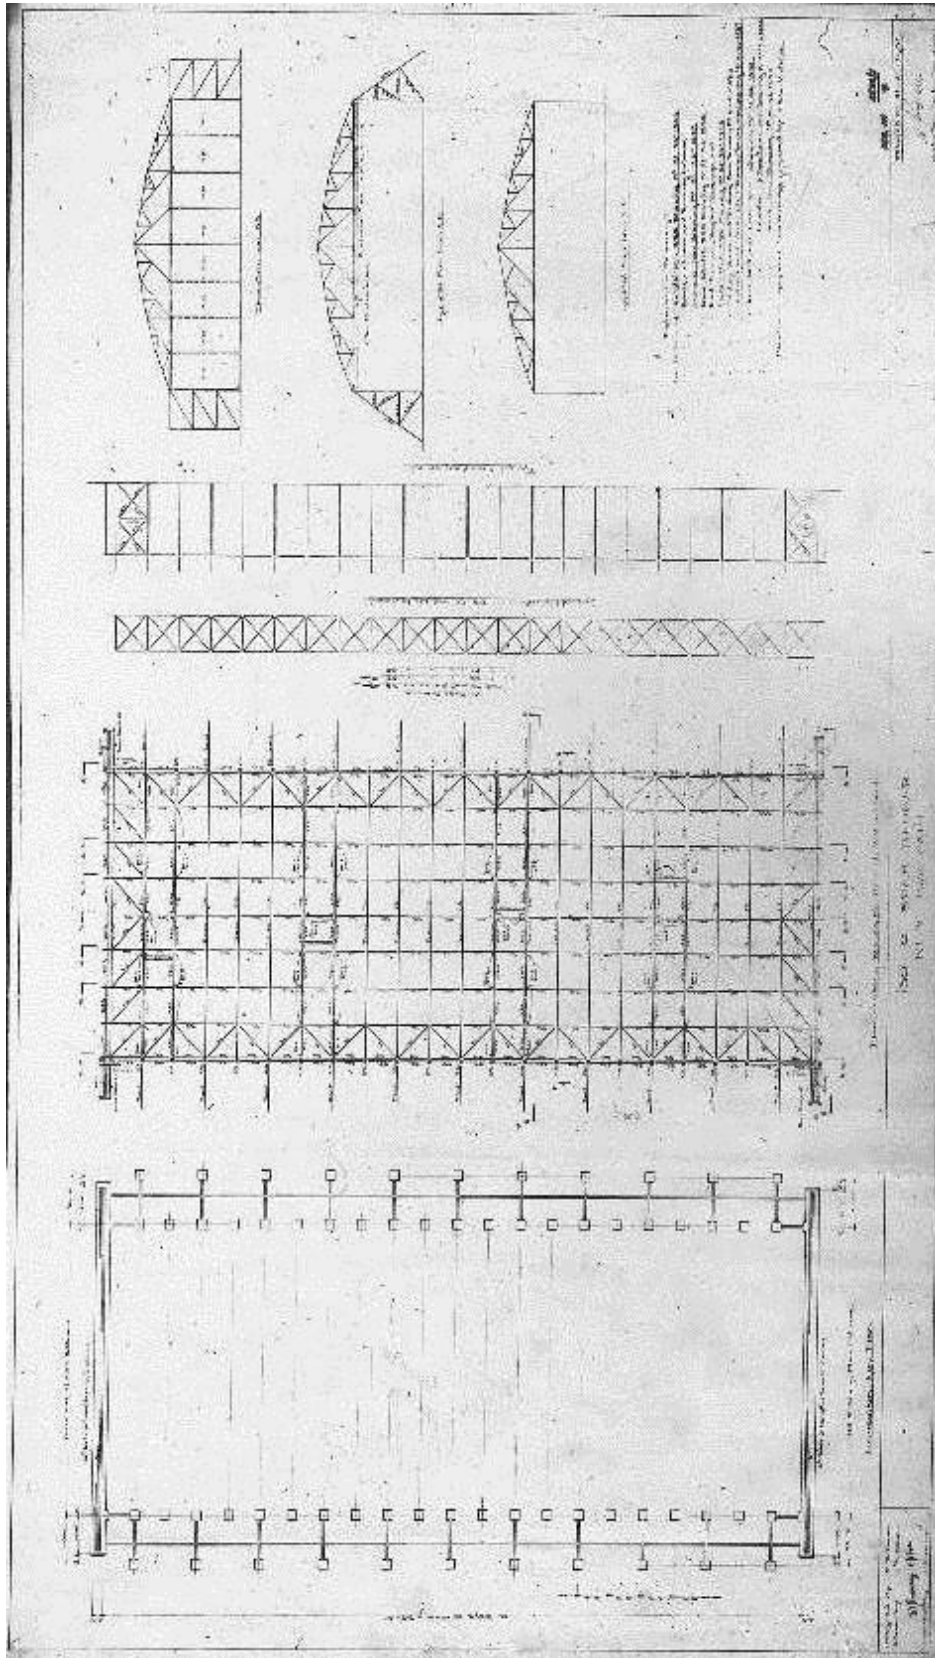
Detailed Drawing of the foundation and general layout for Hangar 1
